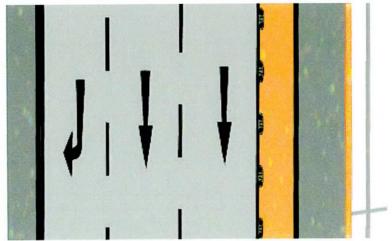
Junction at Blanchardstown Road and Old Navan Road – Bridge over N3
